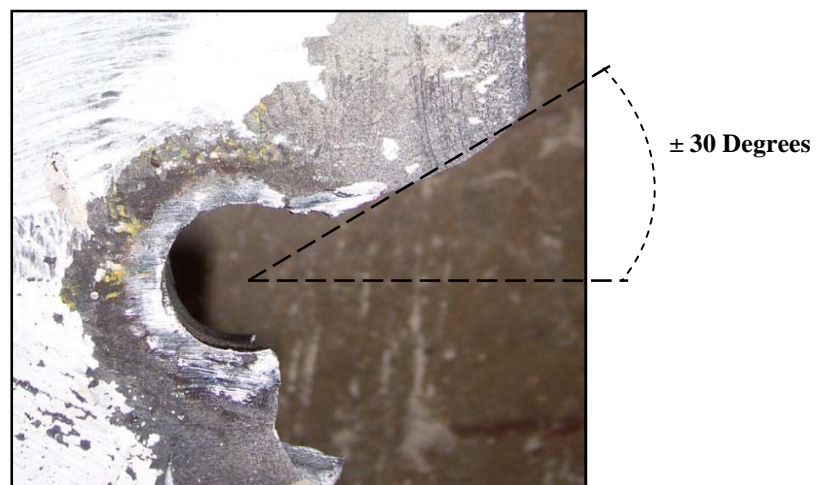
Specimen 4STR1 Initial Failure Mode.
